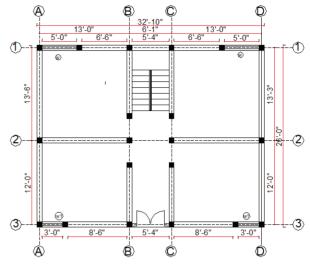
Building Model B_{il} for 3, 4 and 5 storey.
